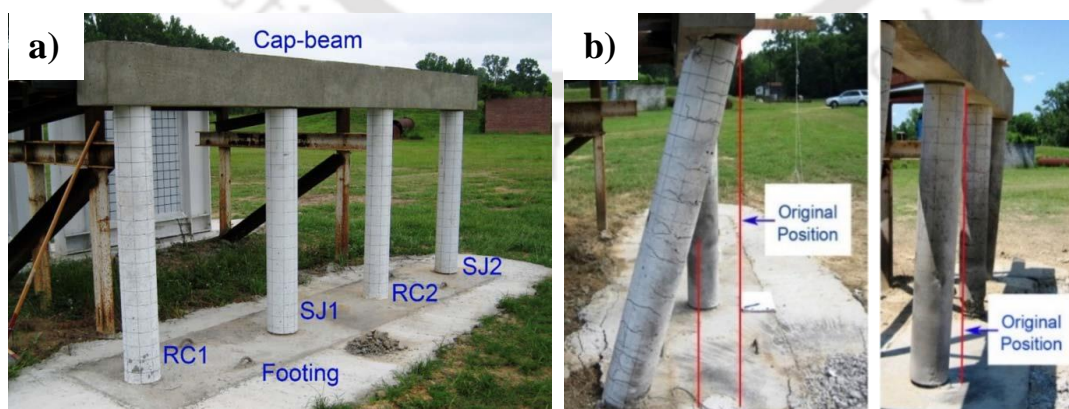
Representative images of blast loading test setup and column deformation of bridge piers (Fujikura and Bruneau 2010)
